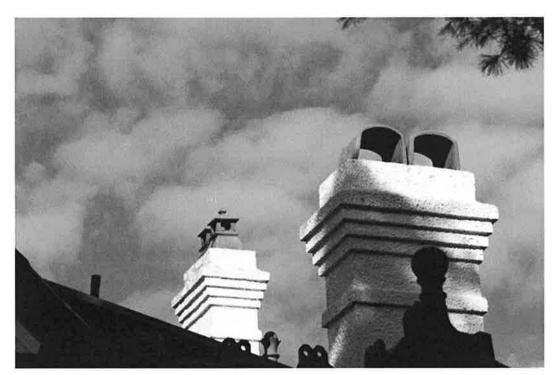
Chimney detail, "Lansdowne" (note two different styles of terracotta chimney pots)
